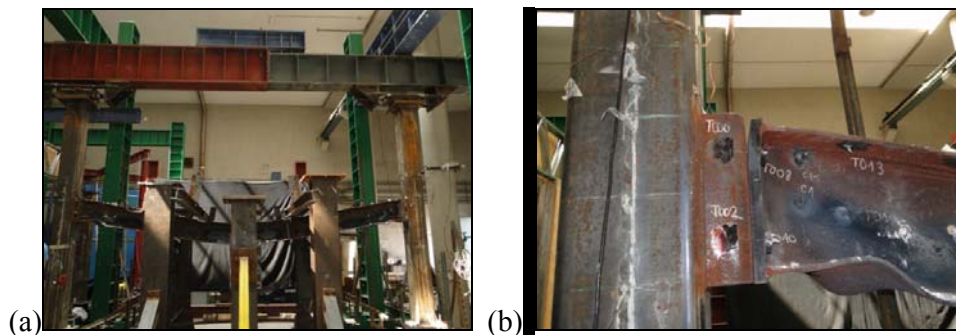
Deformed Shape in the Test 7: (a) Beam; (b) Connection
